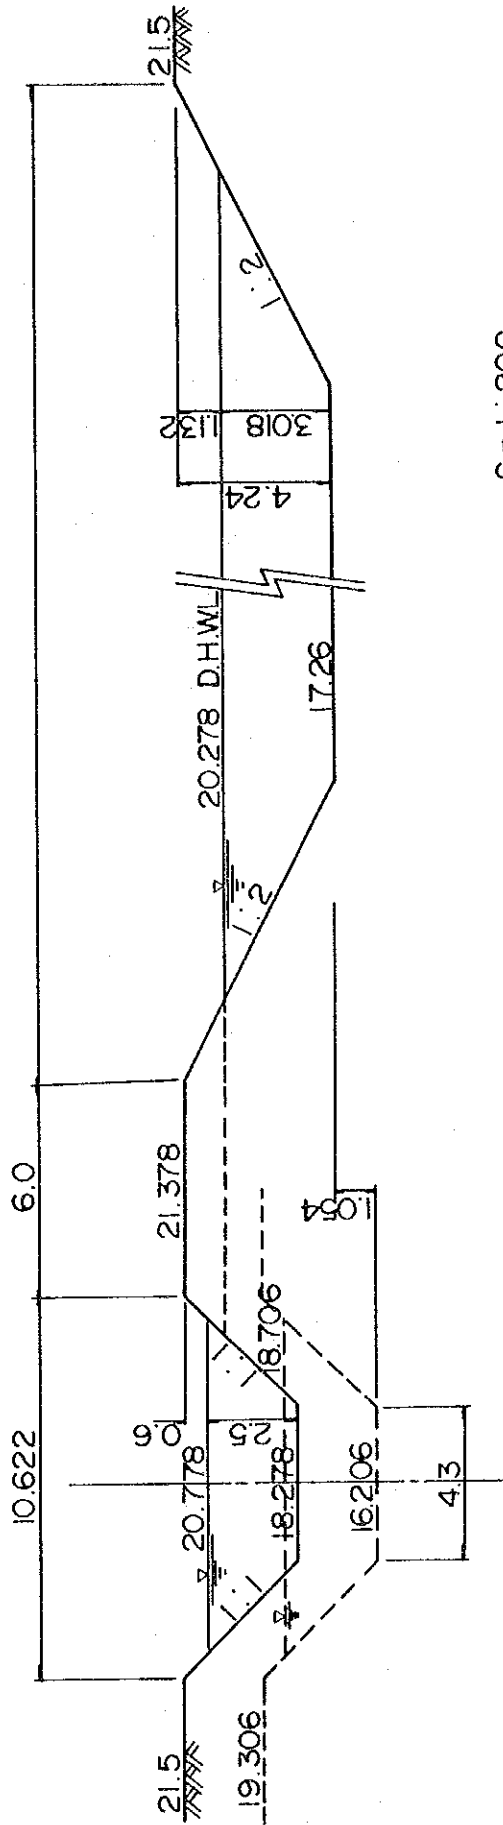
LONGITUDINAL SECTION OF RETENTION POND A
